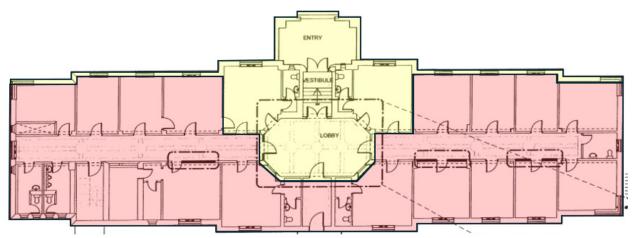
Diagram showing retained sections of the building for Option 3 'retention of north façade, lobby, rotunda, and rooms to accessed from the north wall of the lobby'
